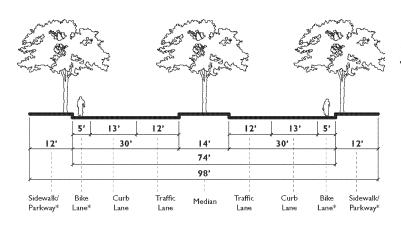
(2 of 2): CITY OF CHINO GENERAL PLAN ROADWAY CROSS-SECTIONS
